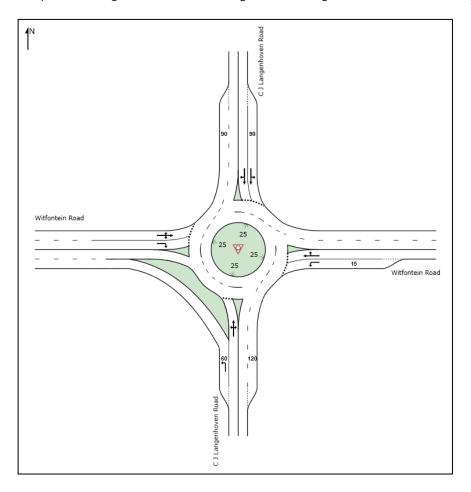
National Route 9 (C J Langenhoven Road) and Witfontein Road: Existing Layout
